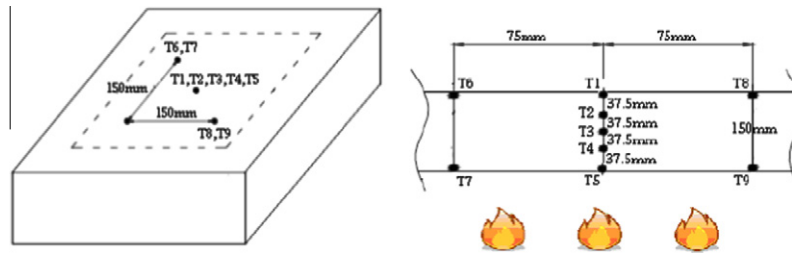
Thermocouple layout on LFC specimens on plan and throughout thickness.
